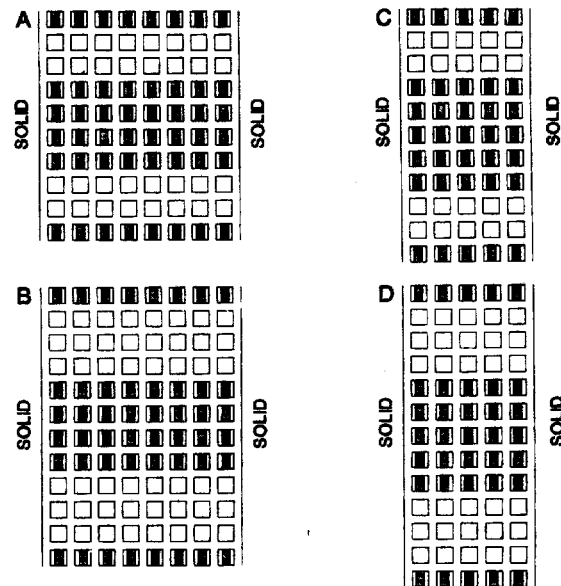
Possible pillar-splitting plans for air-blast control using 6 m wide entries and 12 m wide pillars: (a) nine-entry system, two rows of unsplit pillars for barrier; (b) nine-entry system, three rows of unsplit pillars for barrier; (c) six-entry system, two rows of unsplit pillars for barrier; (d) six-entry system, three rows of unsplit pillars for barrier
